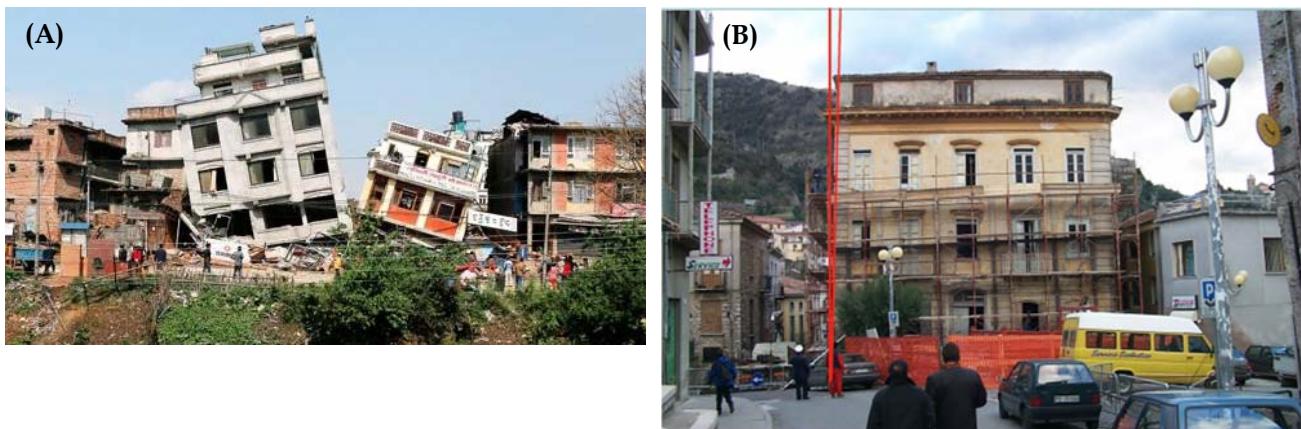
(A) Tilting of building due to structural damage at lower stories; (B) Tilting of building due to soil settlement
